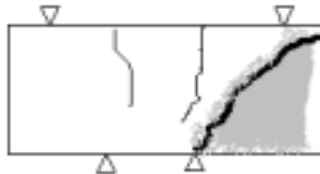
Typical failure modes for Replark® beams reinforced for flexure only.
